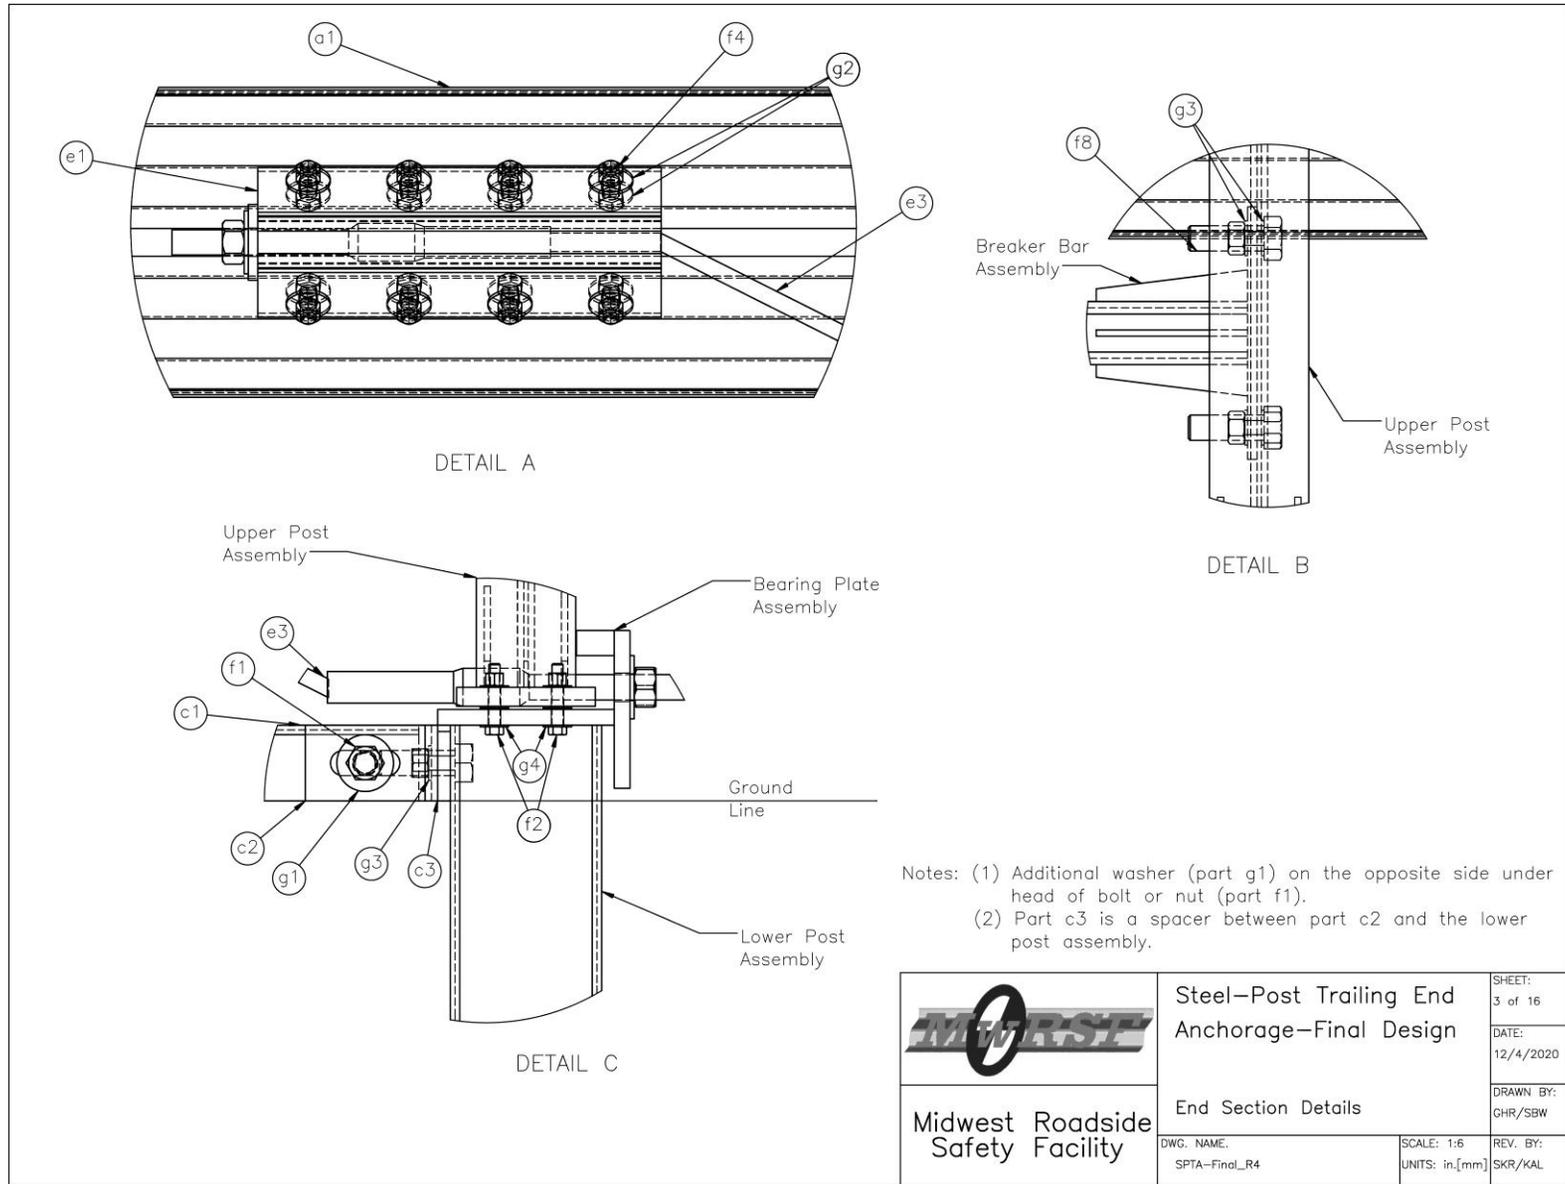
Steel-Post Trailing End Anchorage, End Section Details
